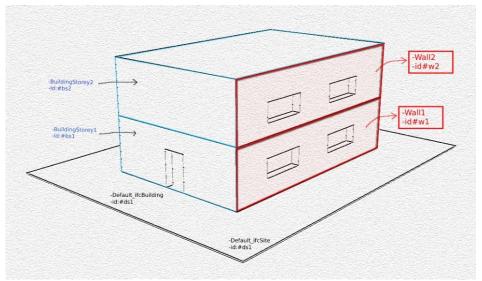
Abstract sketch of preliminary design with highlighted walls and storeys entities
